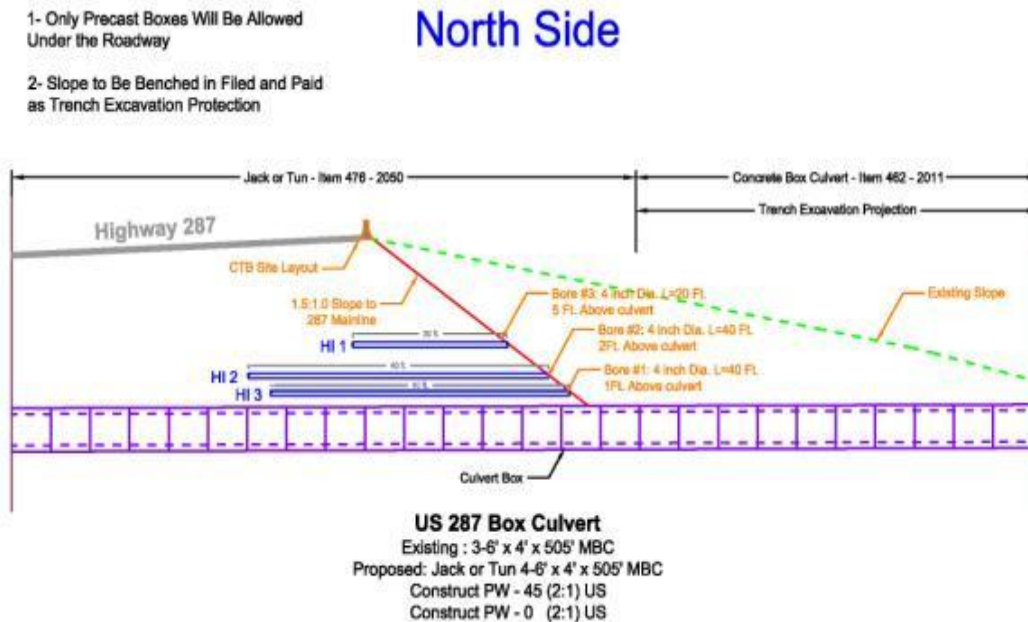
Inclinometer Installation Plan North Side (Tavakoli, 2012)
